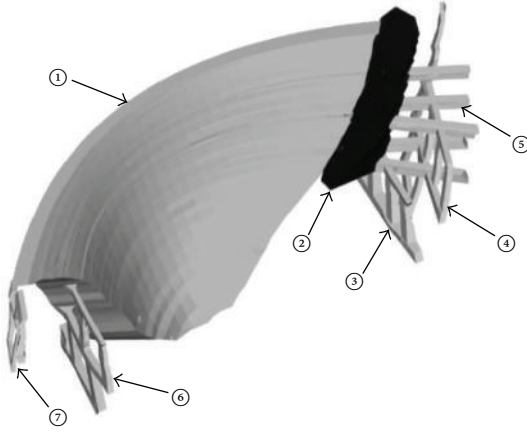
Schematic of the typical reinforcement measures used at the Jinping-I arch dam. ① The hyperbolic arch dam; ② the concrete seating replacement; ③ the concrete grids and hole-plug replacement for the fault f5; ④ the concrete grids and hole-plug replacement for the lamprophyre dike X; ⑤ the concrete shearing resistant holes; ⑥ the concrete grids and hole-plug replacement for the fault f14; ⑦ the concrete grids and hole-plug replacement for the fault f13.
